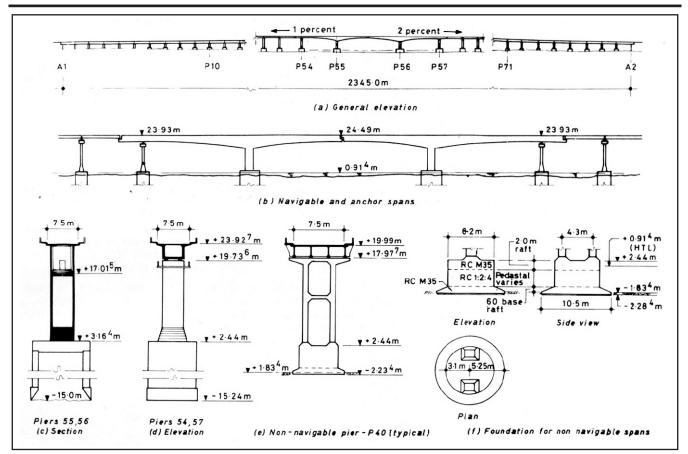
General arrangement of Pamban Bridge, which is the longest bridge built across open sea in India
